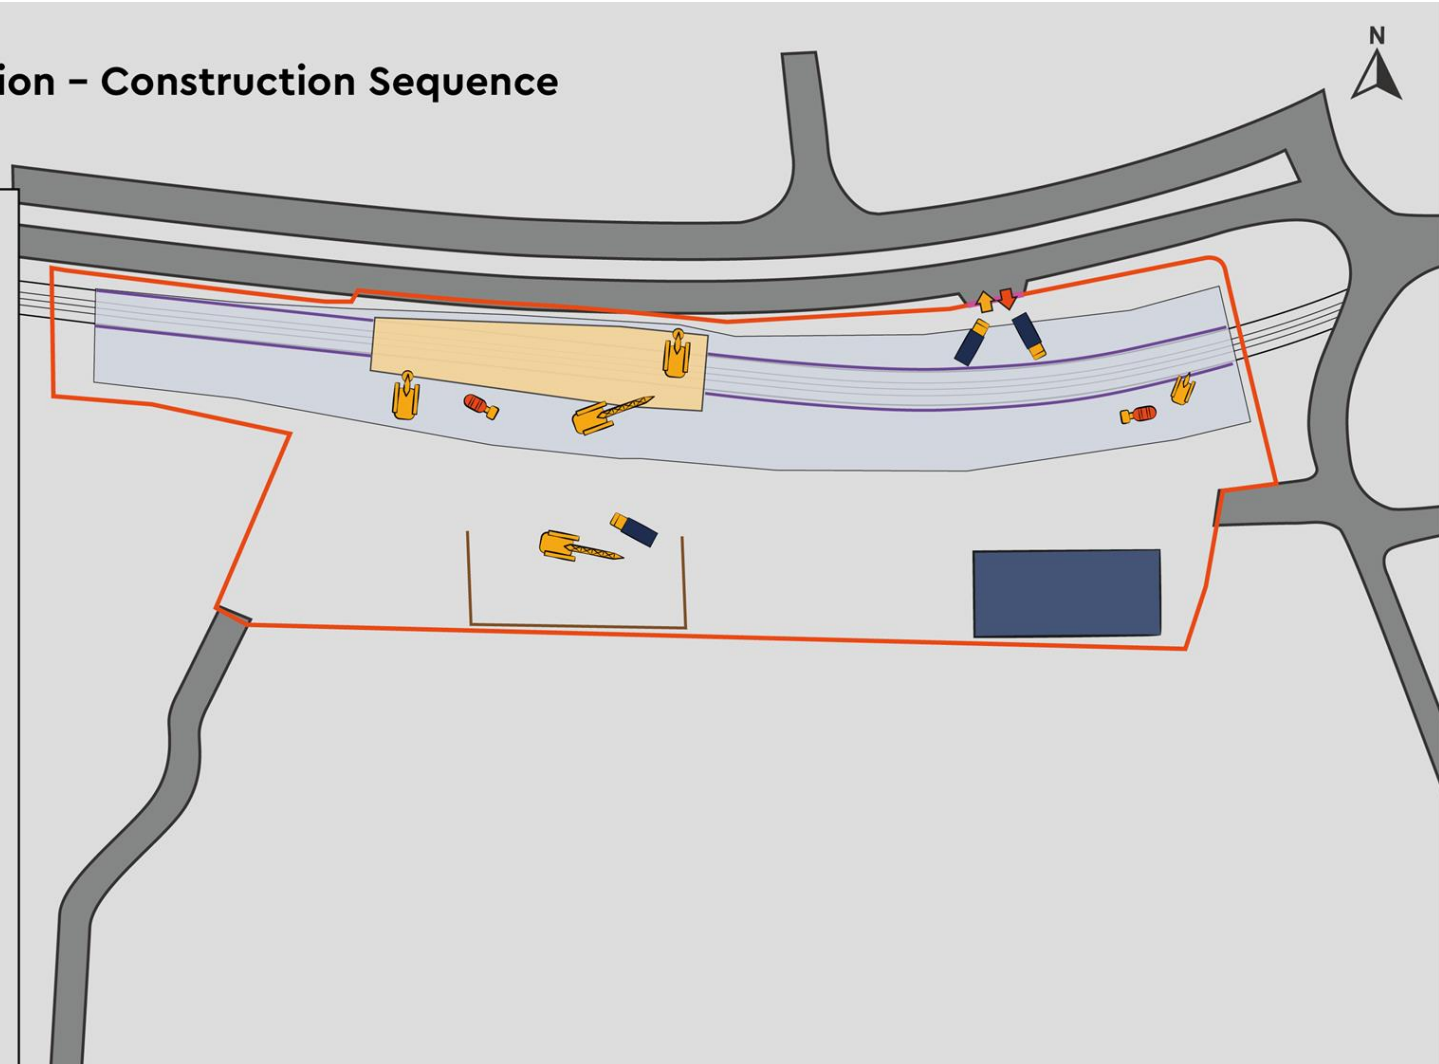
Swords Central Station Stage 2 - Piling Works
